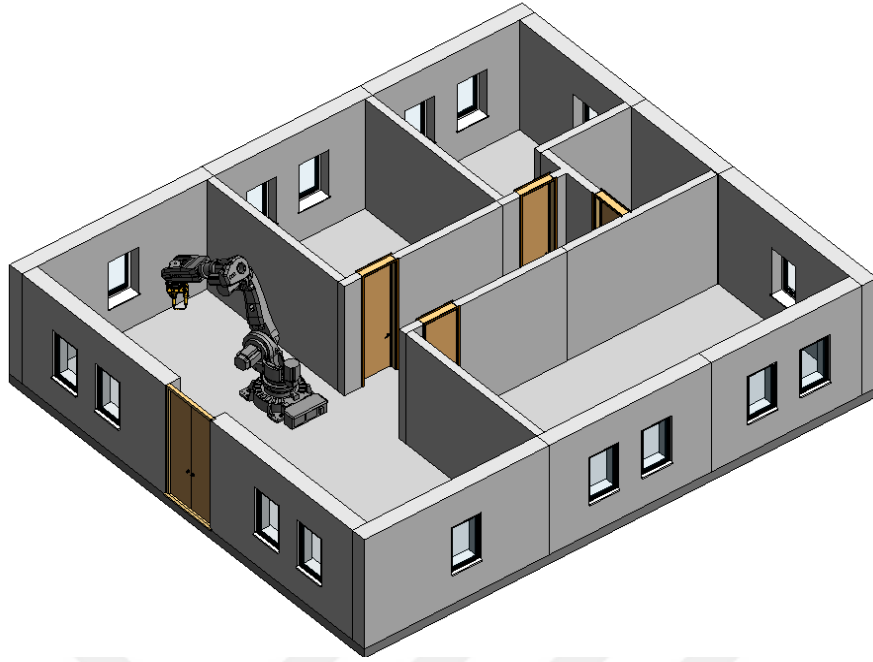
A general 3D view of the BIM of the 3D-printed single-story office building (Autodesk Revit)
